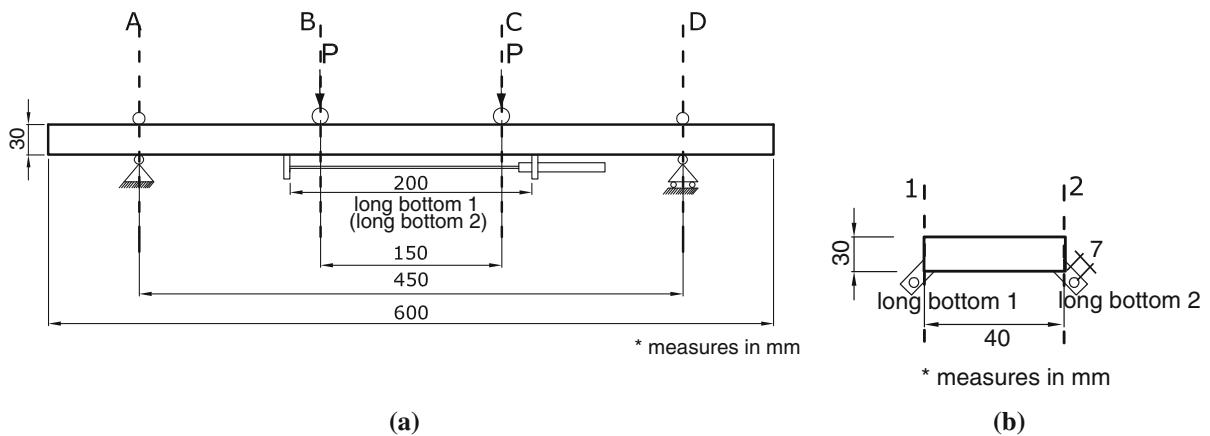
Un-notched beam specimen load scheme: a longitudinal view; b cross section
